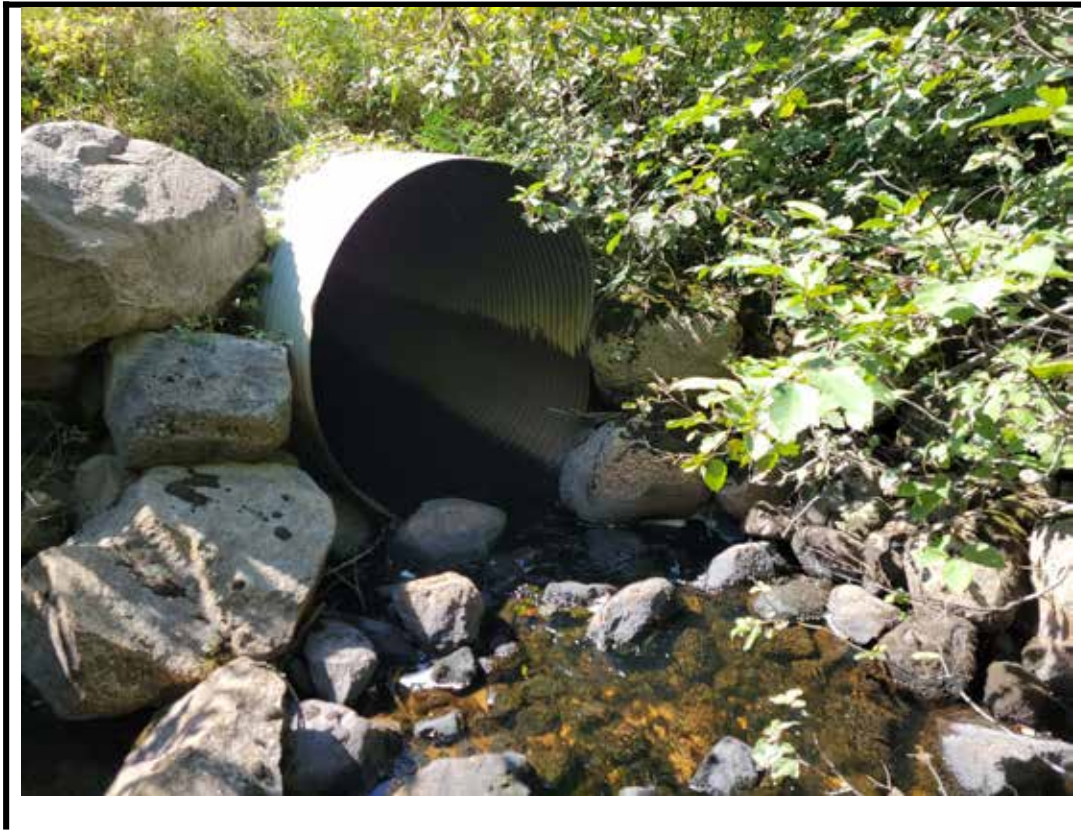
Deformation of east end of north barrel due to large rock slope protection
